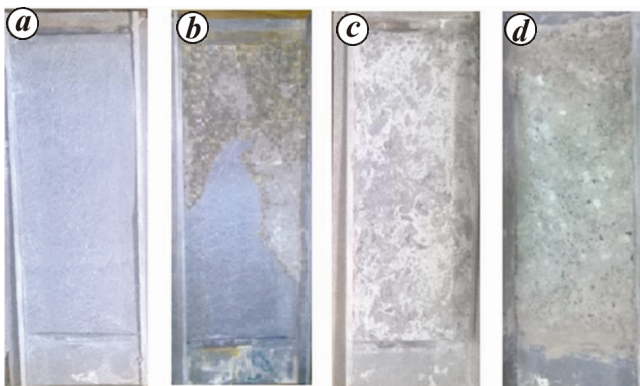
FRP plate after shear test in case of (a) FRP–adhesive bond failure; (b) mixed failure; (c) Adhesive–concrete bond failure and (d) concrete failure modes.
